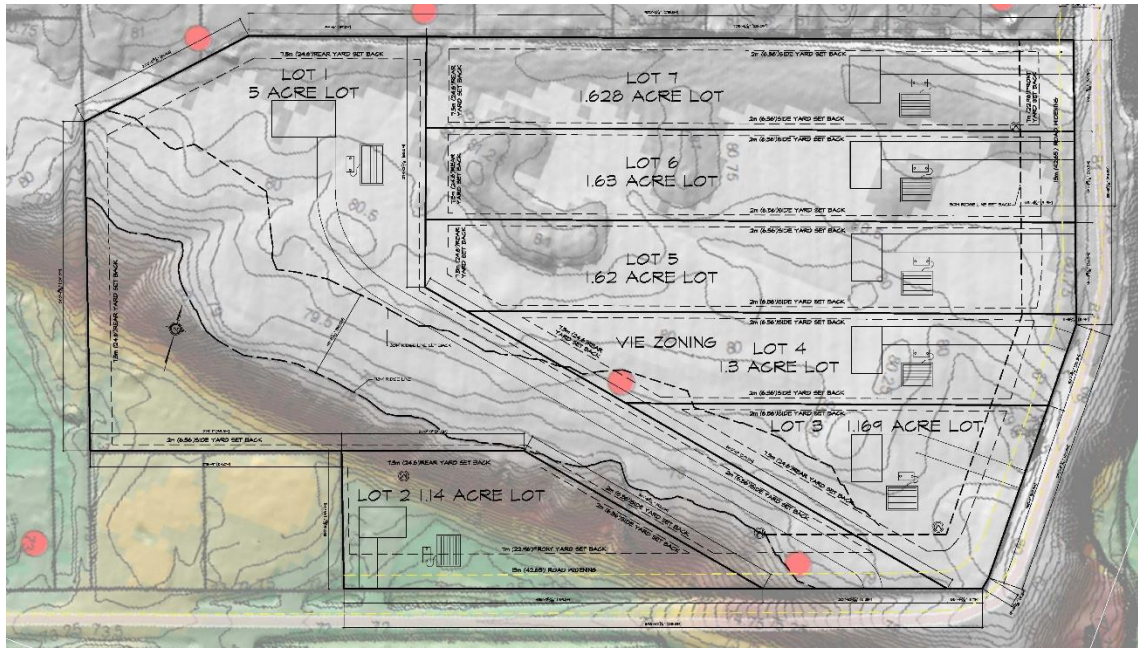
Extract of Site Plan - Overlay on the Terrain
